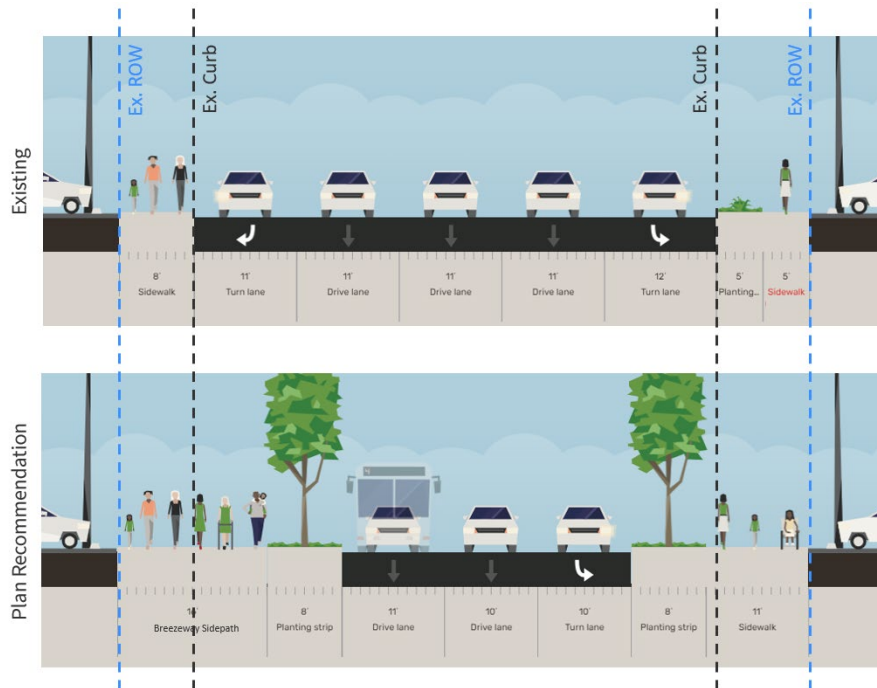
Existing and Recommended Cross Sections for Eastbound University Boulevard in Four Corners
